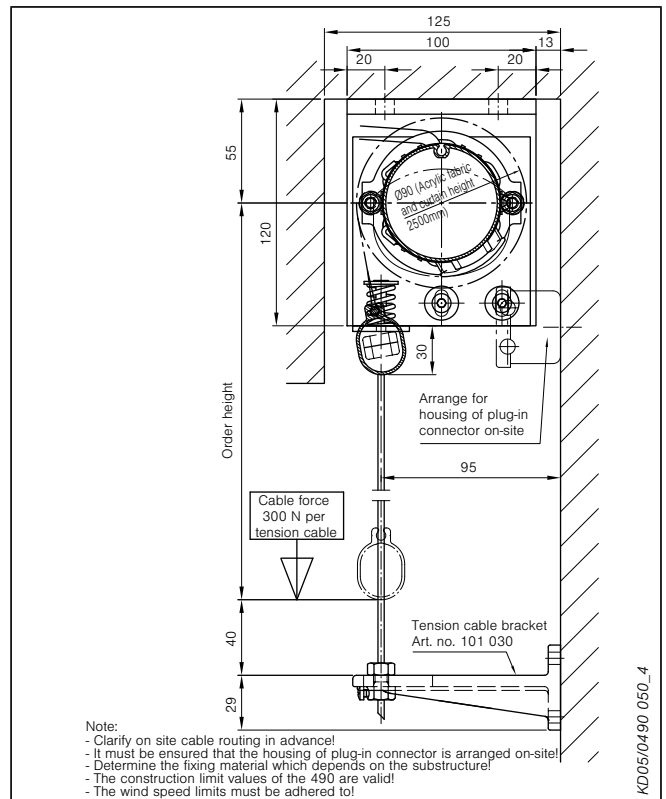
Vertical awning 491 with motor, right rolling with guide cables and ceiling mounting
